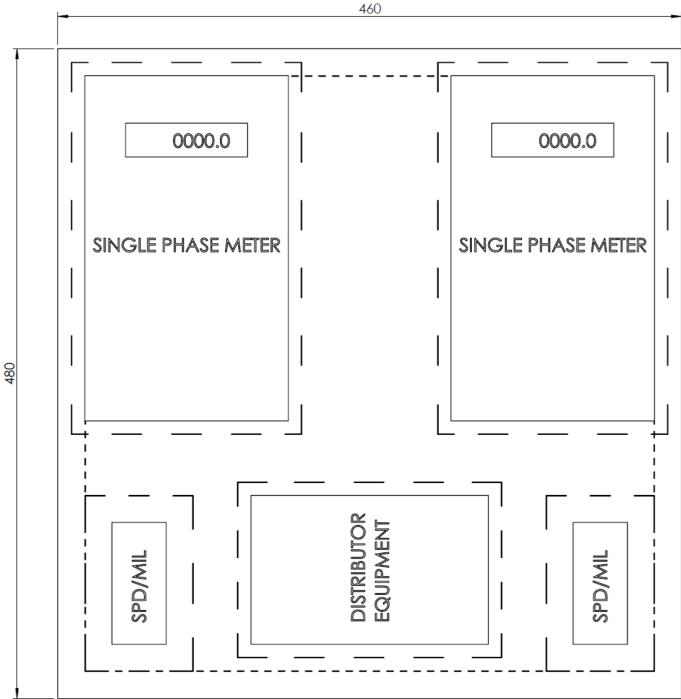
Typical Panel Layout for Residential House with two single phase meters and load control
